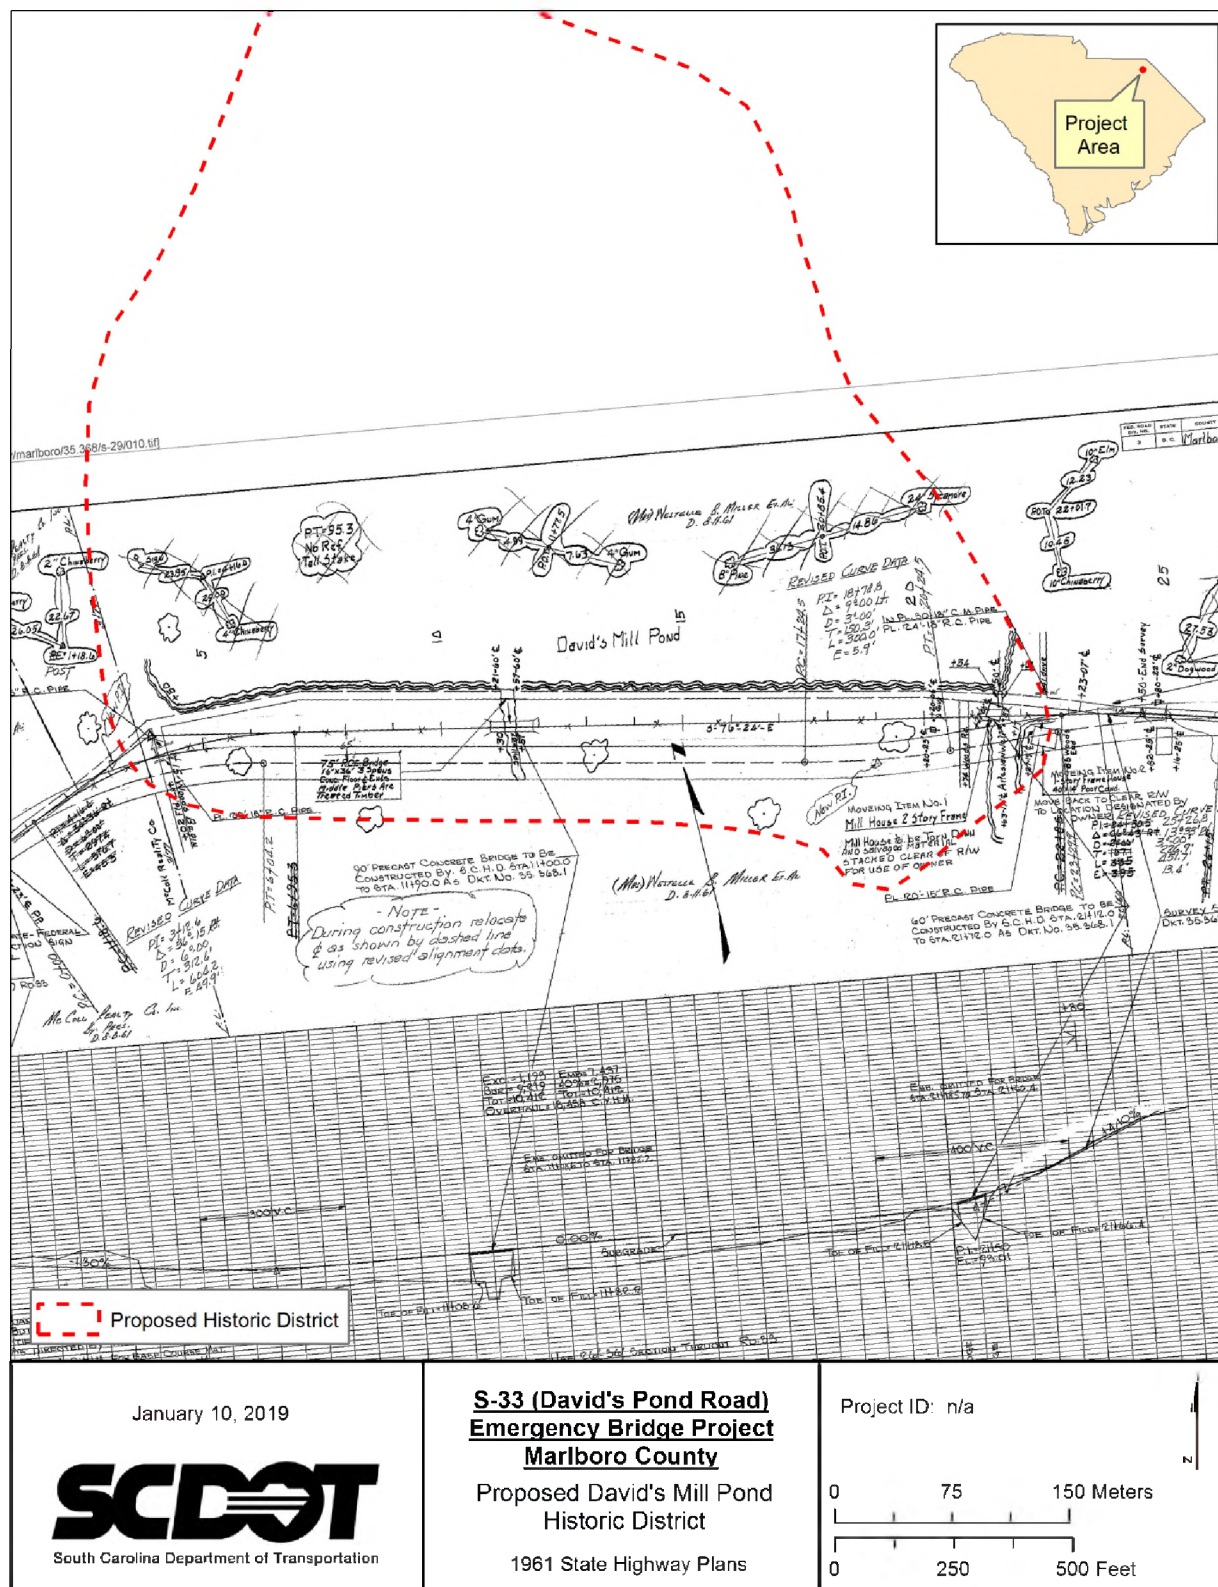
1961 SCDOT Highway Plans Showing David's Pond Mill (SCDOT 1961).
